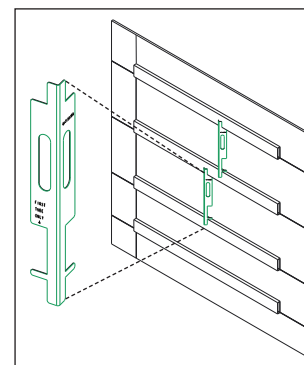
Use Horizontal Tube Layout Jig for Subsequent Rows
